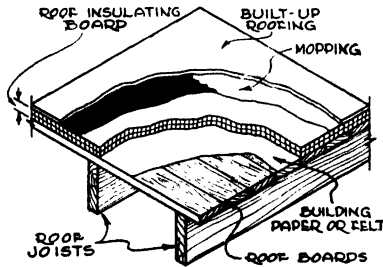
Wood Roof Deck, Building Paper or Felt, Roof Insulation Board and Built-up Roofing
